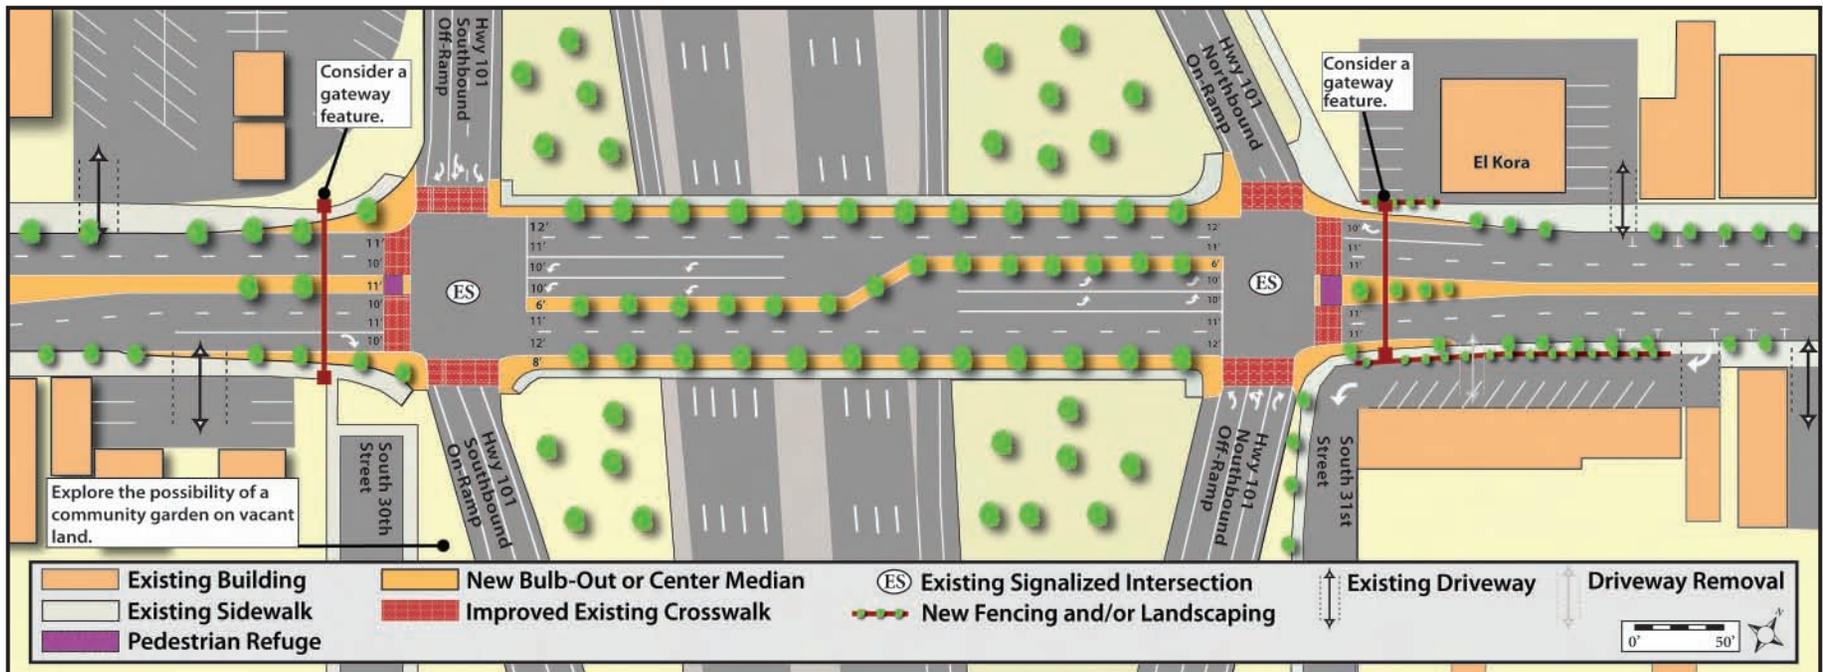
East Santa Clara Street/Alum Rock Avenue - Segment #6.
